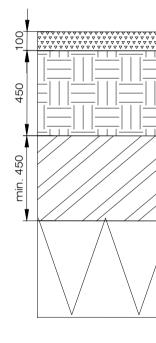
Drawing LD-02-PP Topsoil depths and Bark Mulch specification to planted areas Scale @ 1:20
